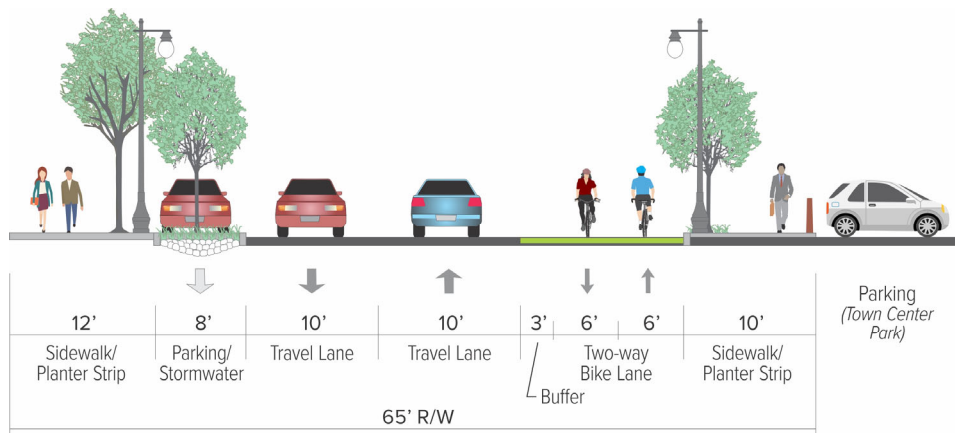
TOWN CENTER PLAN CROSS-SECTIONS (CONT.)
